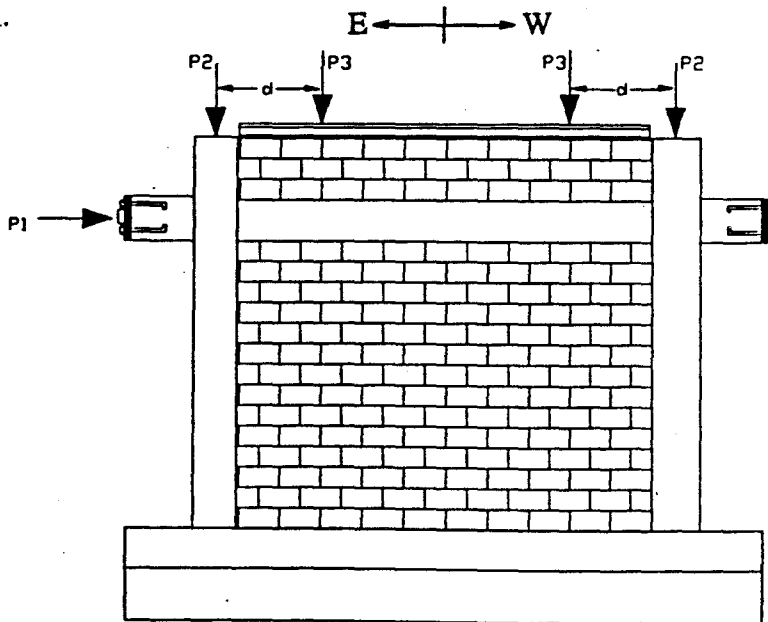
Vertical Load Distribution on Columns and Beam in Single-Bay Specimens ($d = 16.5''$).
